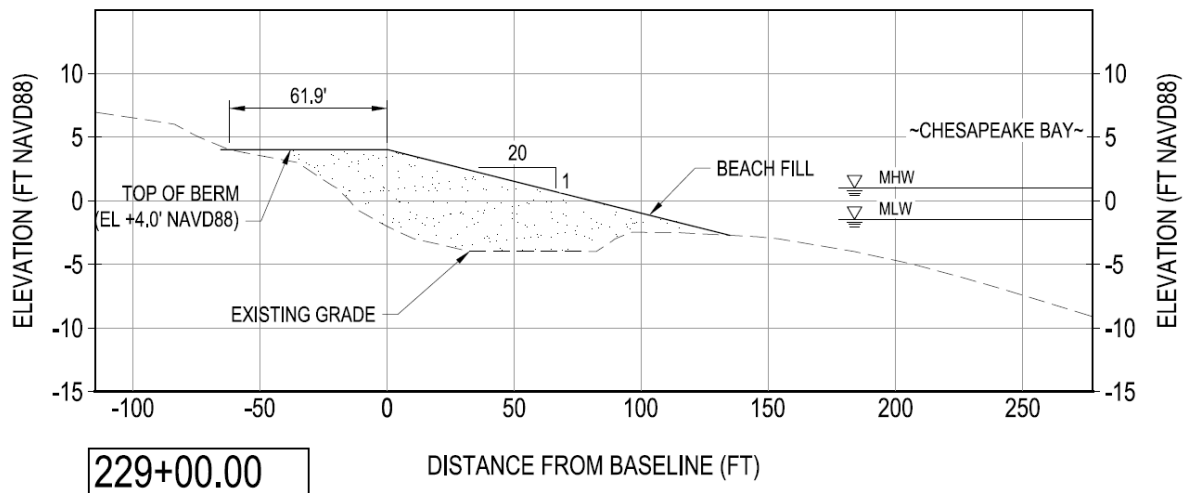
Typical beach profile showing existing grades and proposed nourishment construction in Reach 3 (STA 229+00)
